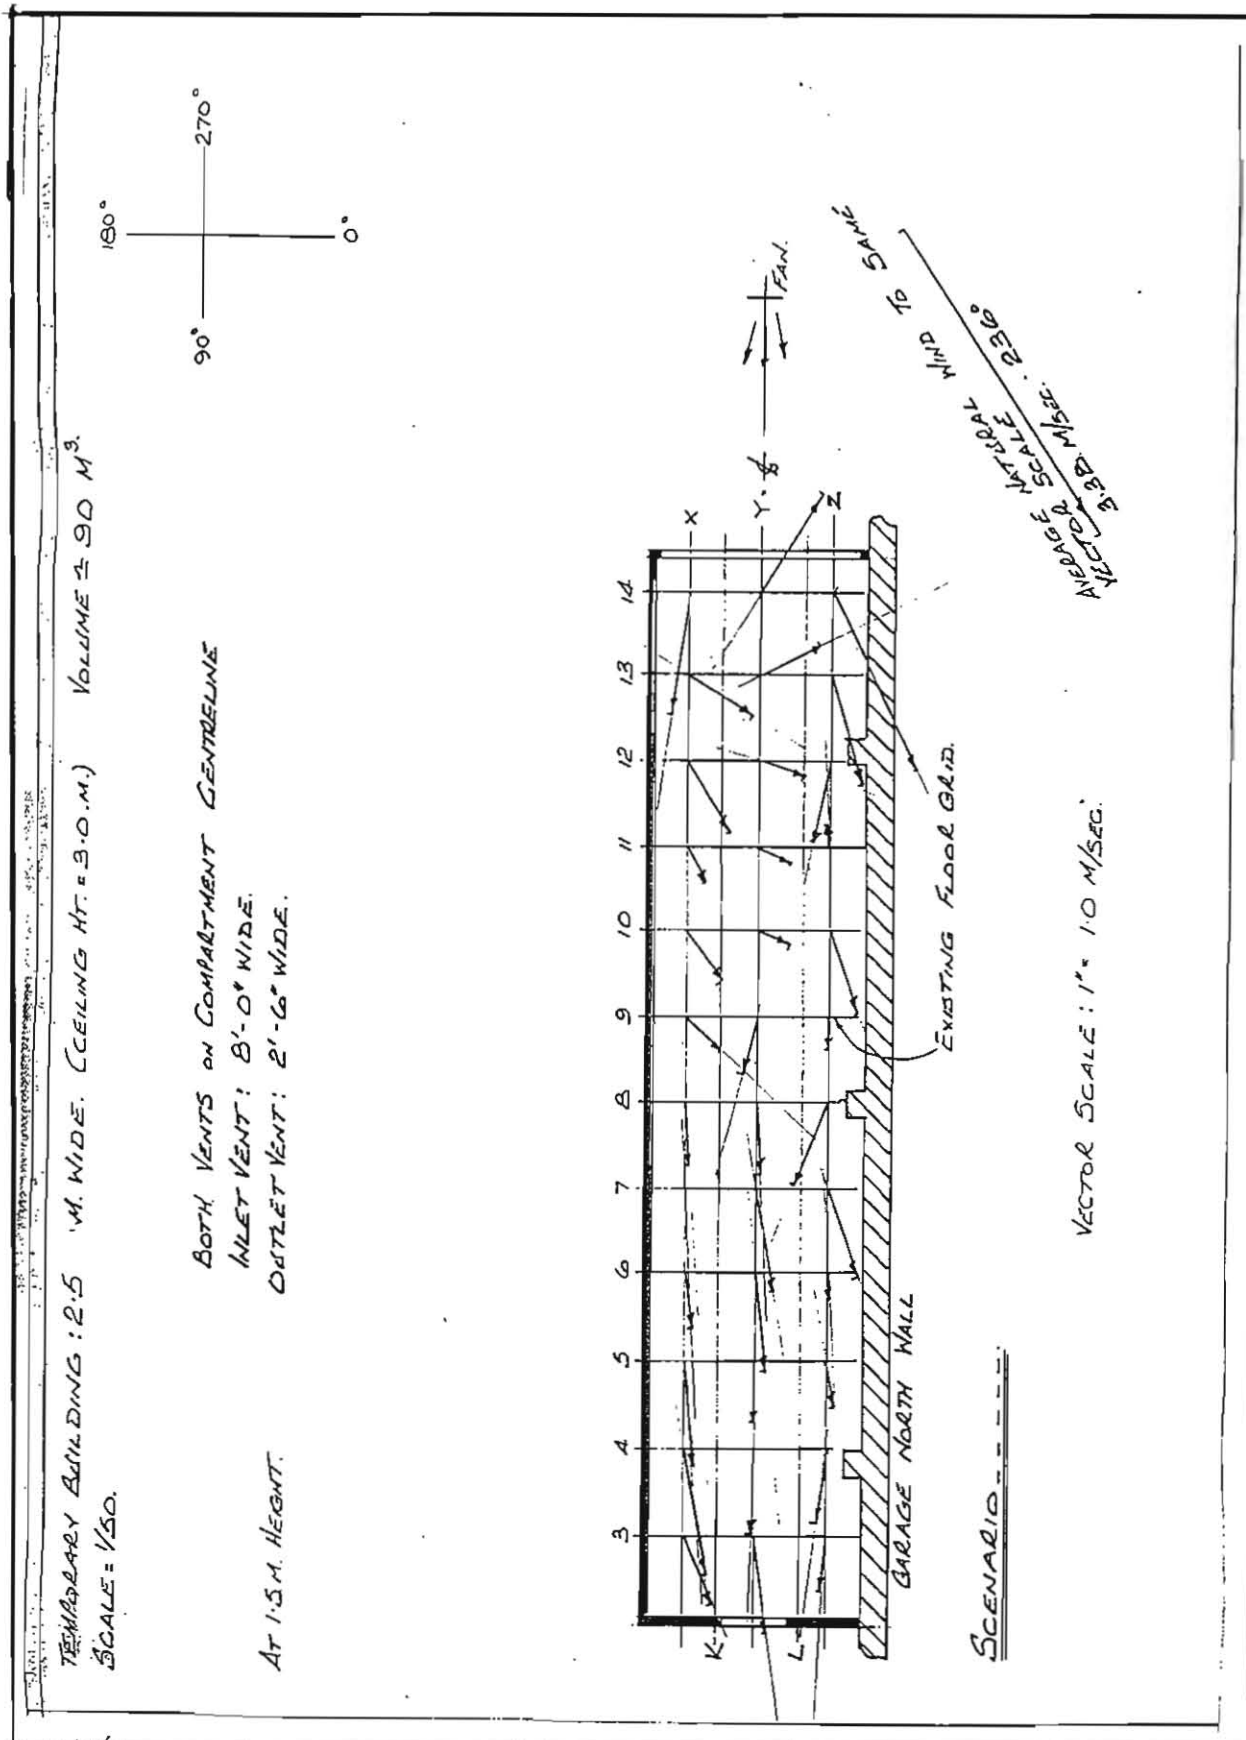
Airflow survey in 2.5 metres wide compartment: 8' 0" inlet - 2' 6" outlet.
